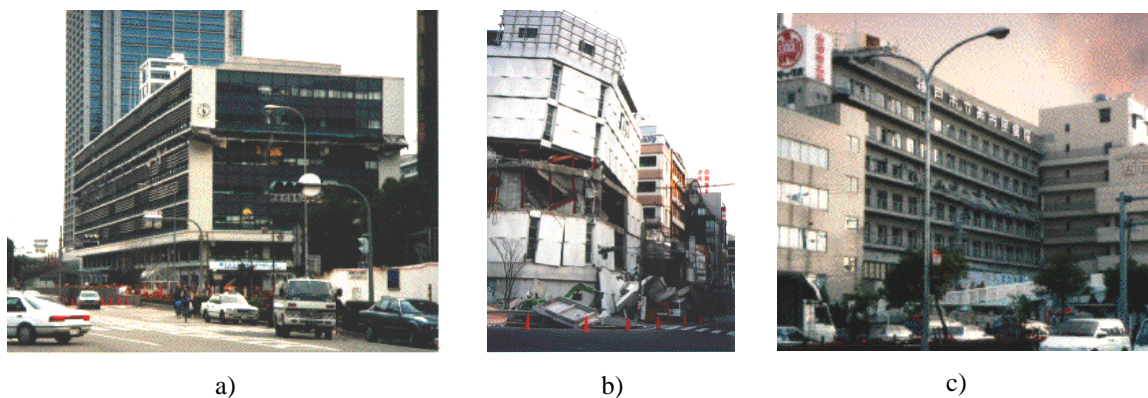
RC frame structures with a mid-height collapse (KOBEnet, 1995): a) collapsed 6<sup>th</sup> storey of an eight-storey high office building; b) intermediate storey damage of a moderately high building; c) 5<sup>th</sup> storey collapse of hospital
